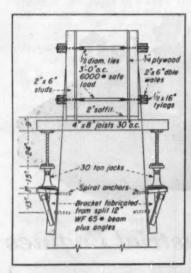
FALSEWORK ANCHORS In piers simplify form building and leveling on top. Screw jacks, steel beams help.
